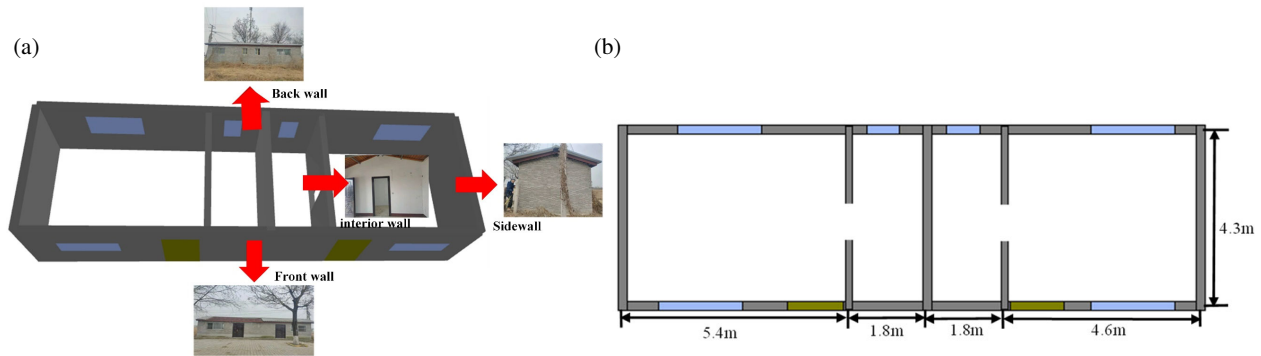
Multi-room building structure: (a) 3D schematic diagram and (b) plan sketch.
